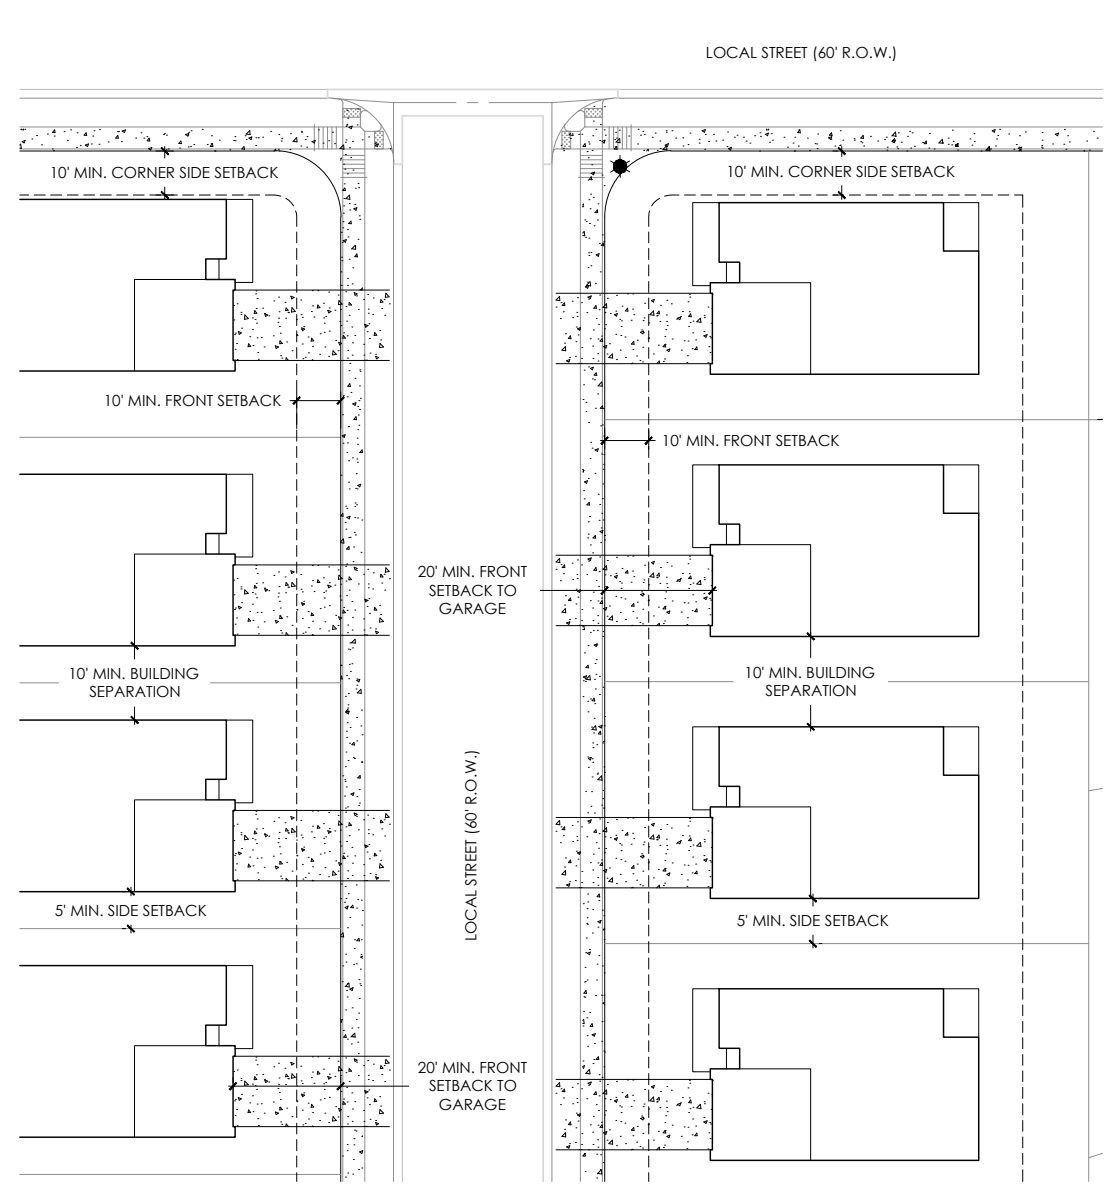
EXHIBIT A - SINGLE FAMILY DETACHED LOT TYPICAL
